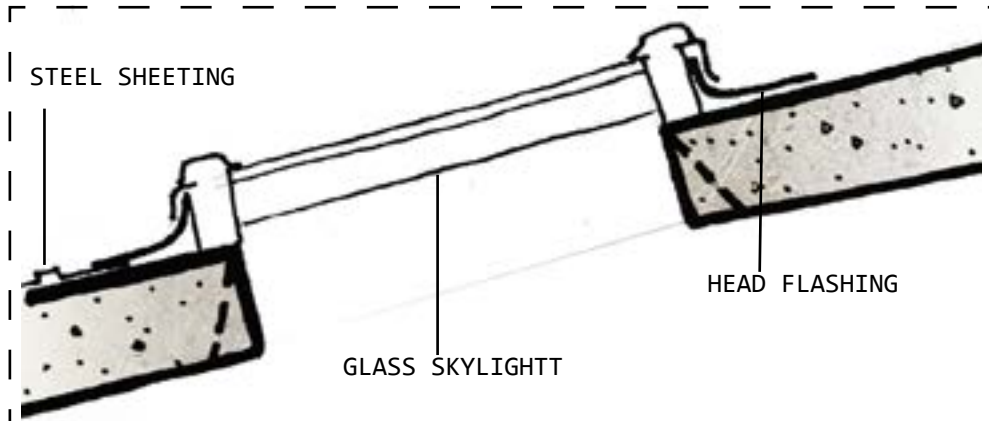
L: [DETAIL 5] Skylight (Author, 2021)
